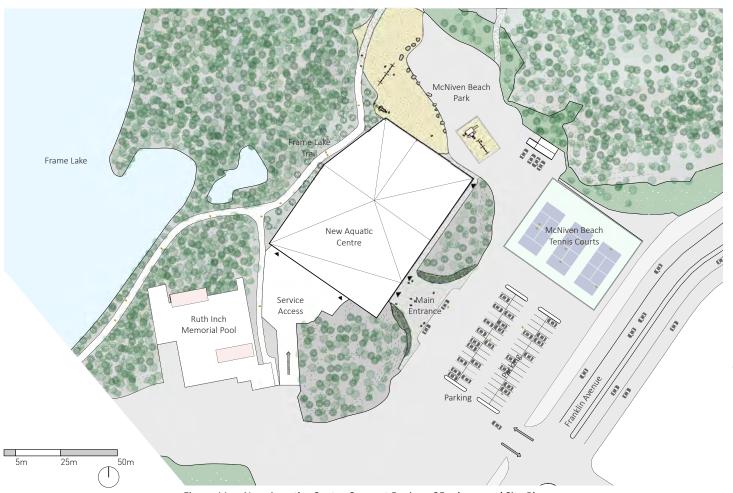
New Aquatics Centre Concept Design - 25m lane pool Site Plan
